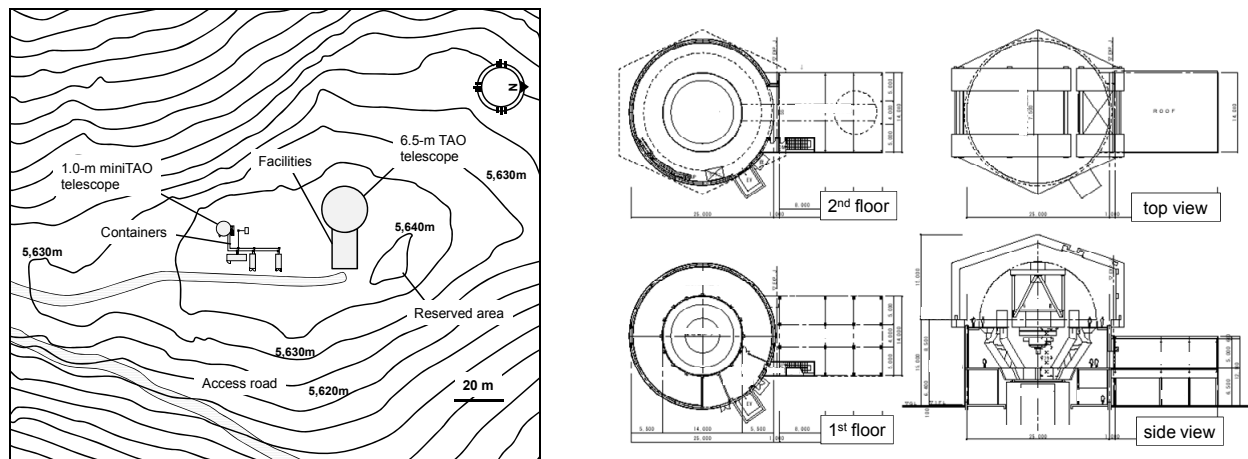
(Left) Summit layout plan for the TAO facilities, where north is right. The 6.5m telescope and its support buildings will be built at the middle. The 1m miniTAO telescope is at the south west corner, and its support facilities are between the two telescopes. The highest place at the north east corner is preserved permanently. (Right) Current design of the enclosure and the support building of the 6.5m telescope.
